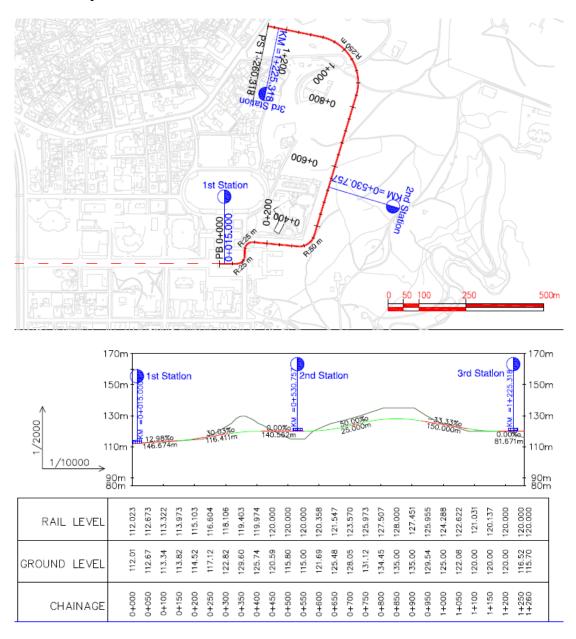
Nene Teraza – Qytet Studenti Connection Plan & Profile
